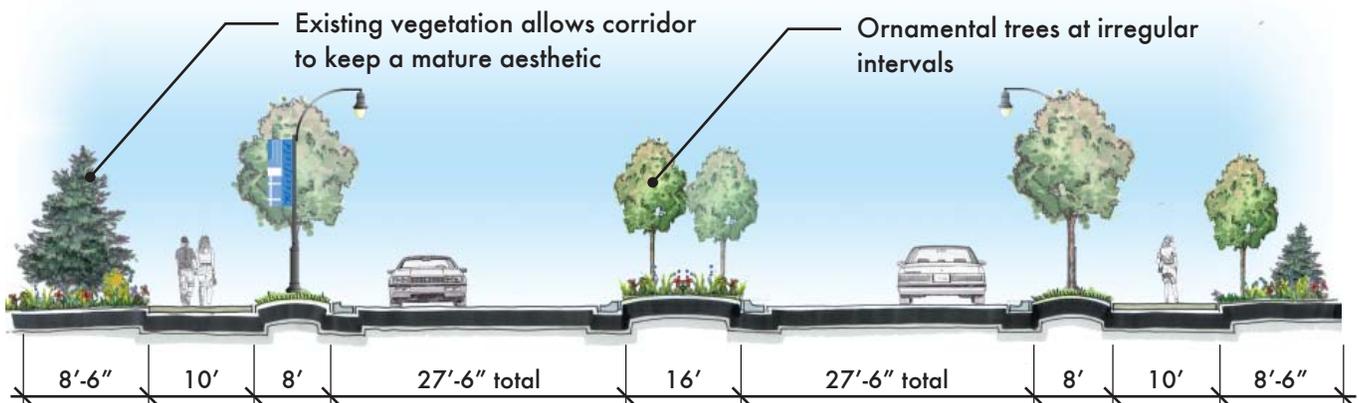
Typical cross-section illustrating the typical landscape application to a 120' right-of-way.
